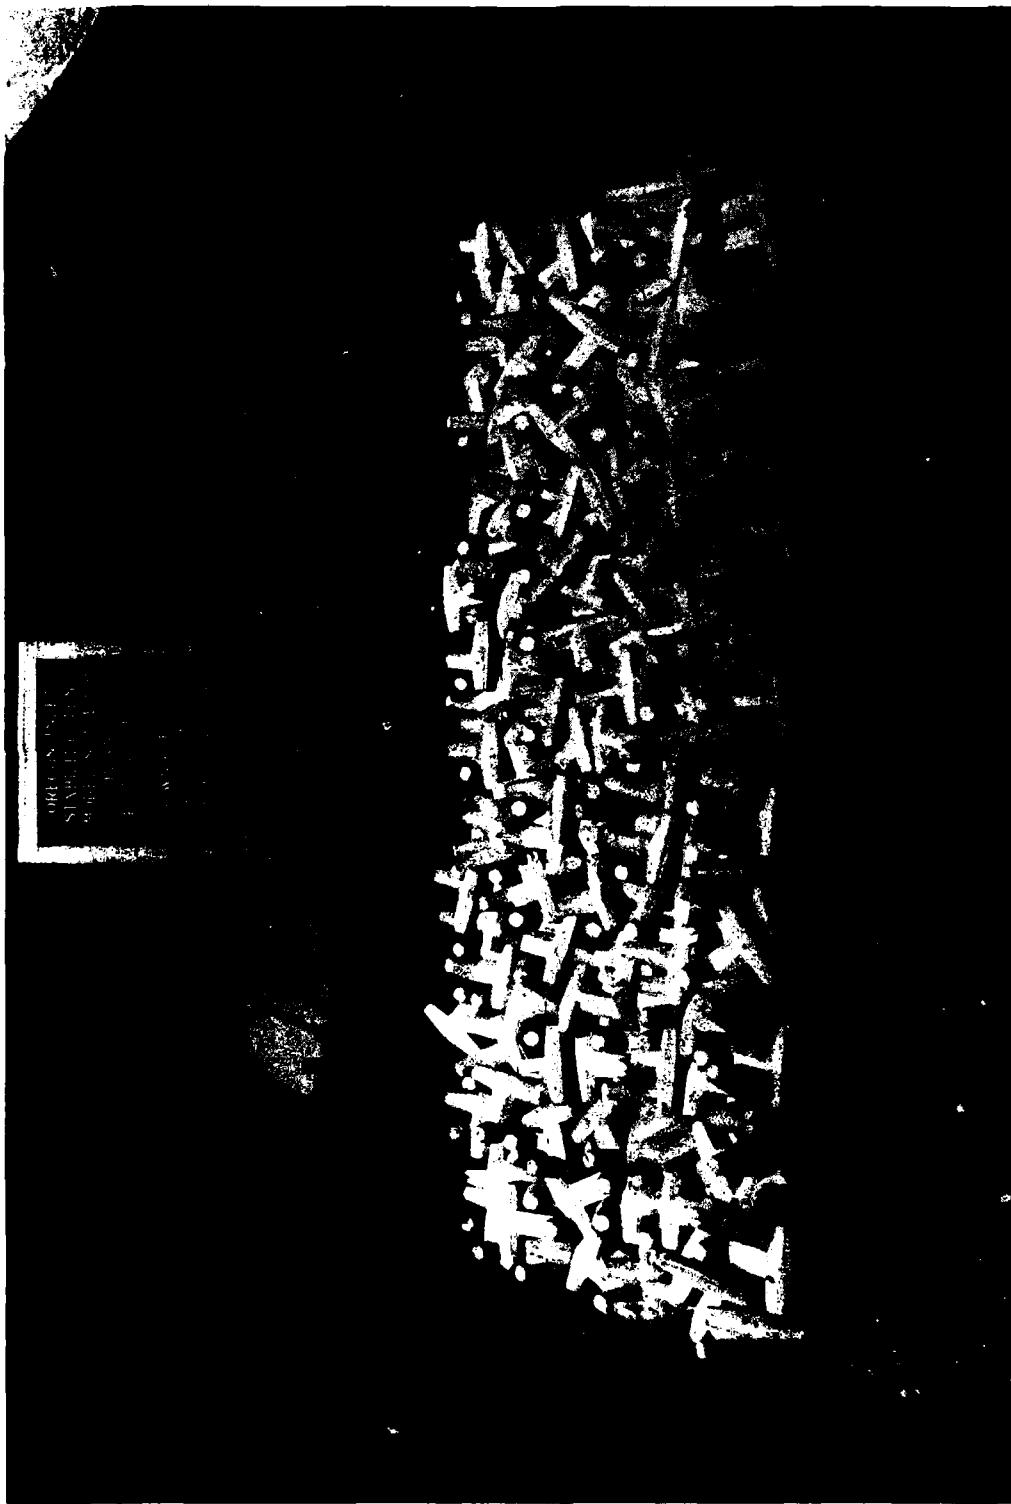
Repeat test of Plan 15; sea-side view before wave attack
